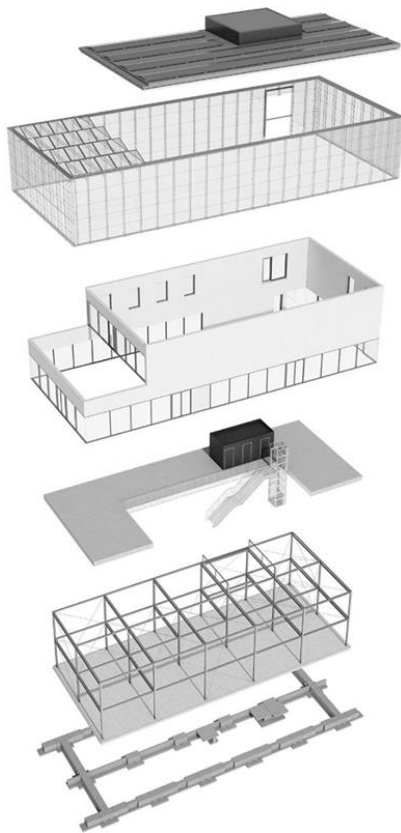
Building layers of The Green House (De ingenieur, 2018)
